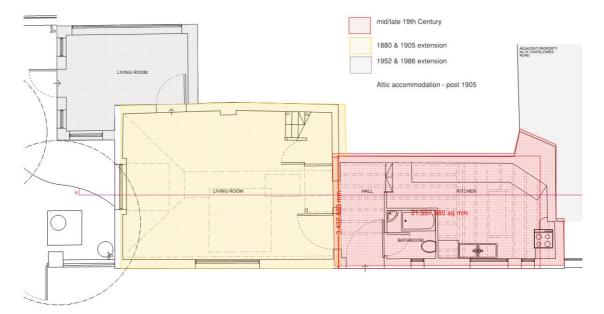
Ground floor plan indicating the date of each phase of development at the site.
